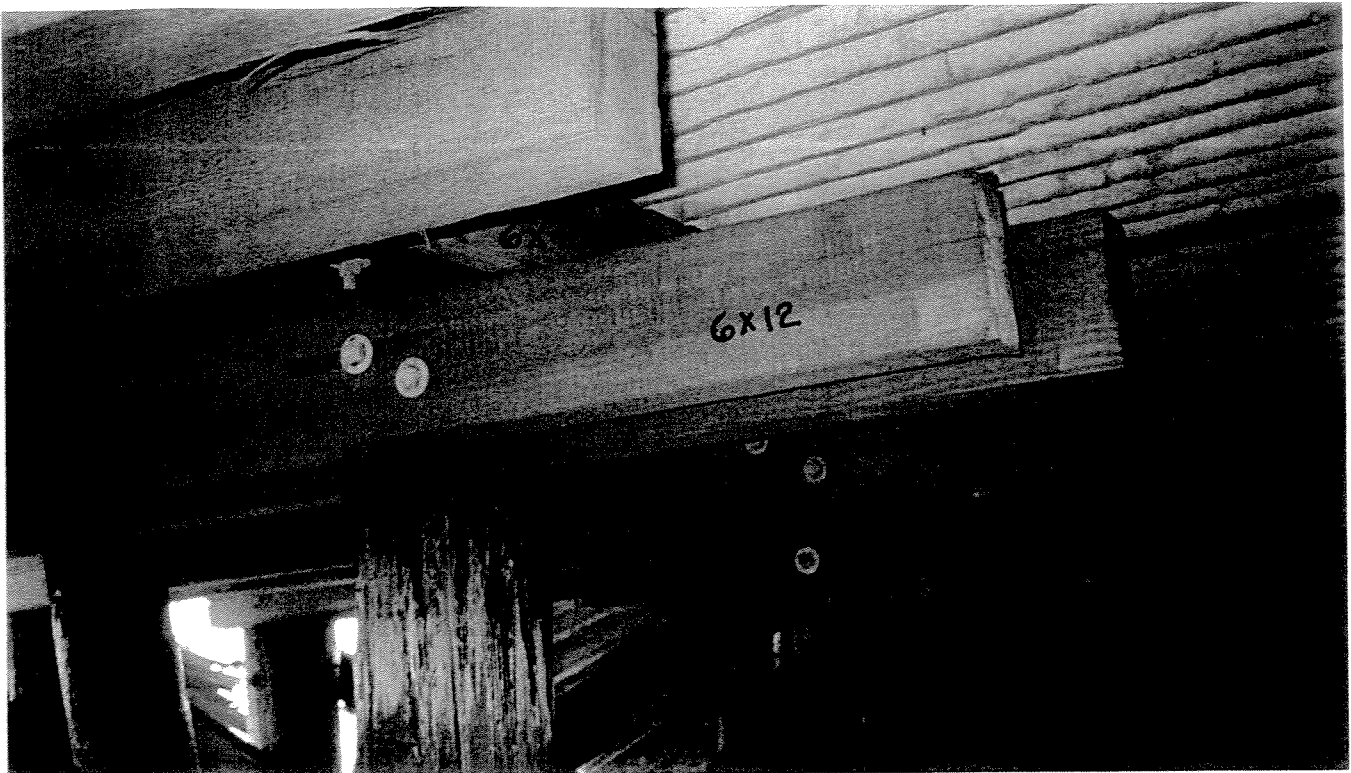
Pile bent 79, pile "B" showing general configuration and construction. Note 6x 10 timber "sistered" to 12 x 12 cap acting as a ledger to support the corrugated steel deck form. Transverse 6 x 12 horizontal timbers serve as bracing and provide connection of battered piles at bent 80 (see photo 8) , looking SE.
